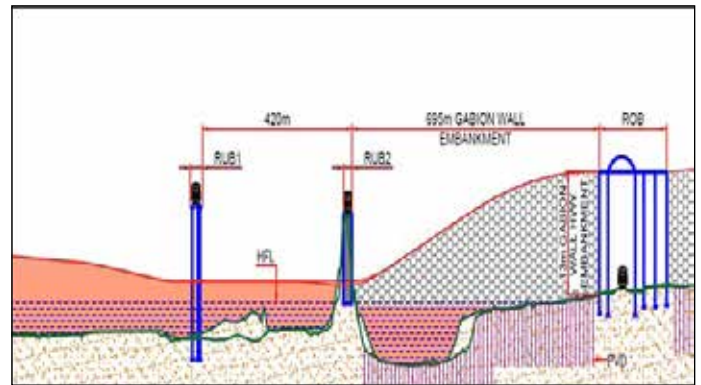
Proposal of RUBs 1&2 Reduced Highway Embankment Height
